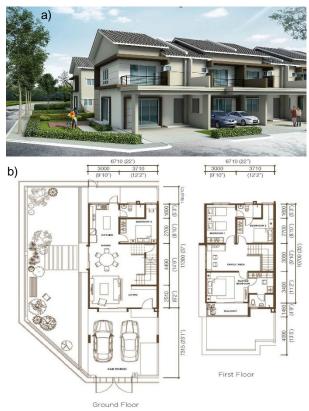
Model of Malaysian double-storey detached house, a) Artist impression and b) Floor plan.
